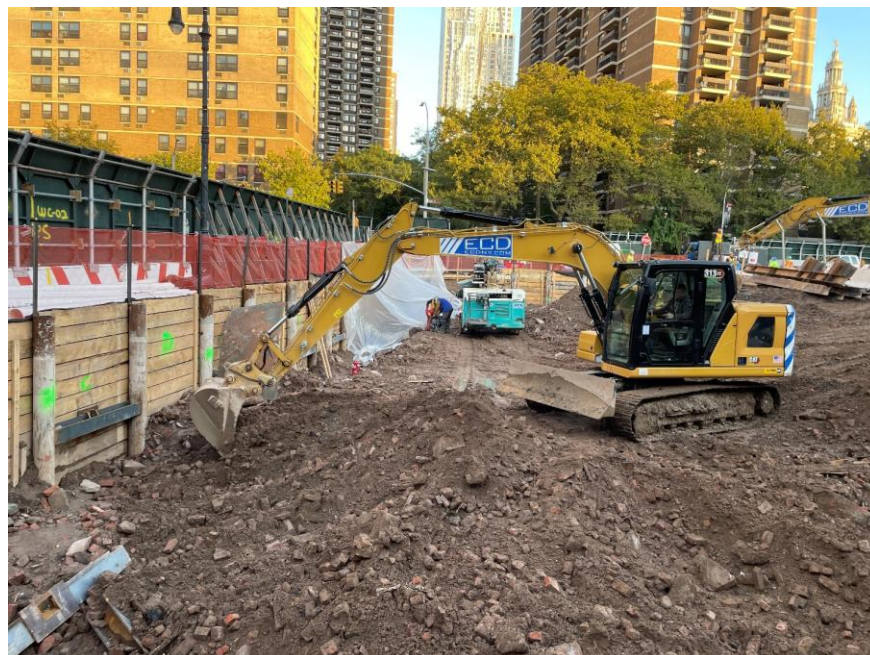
ECD excavating soil/fill in the western part of the site (facing north)
